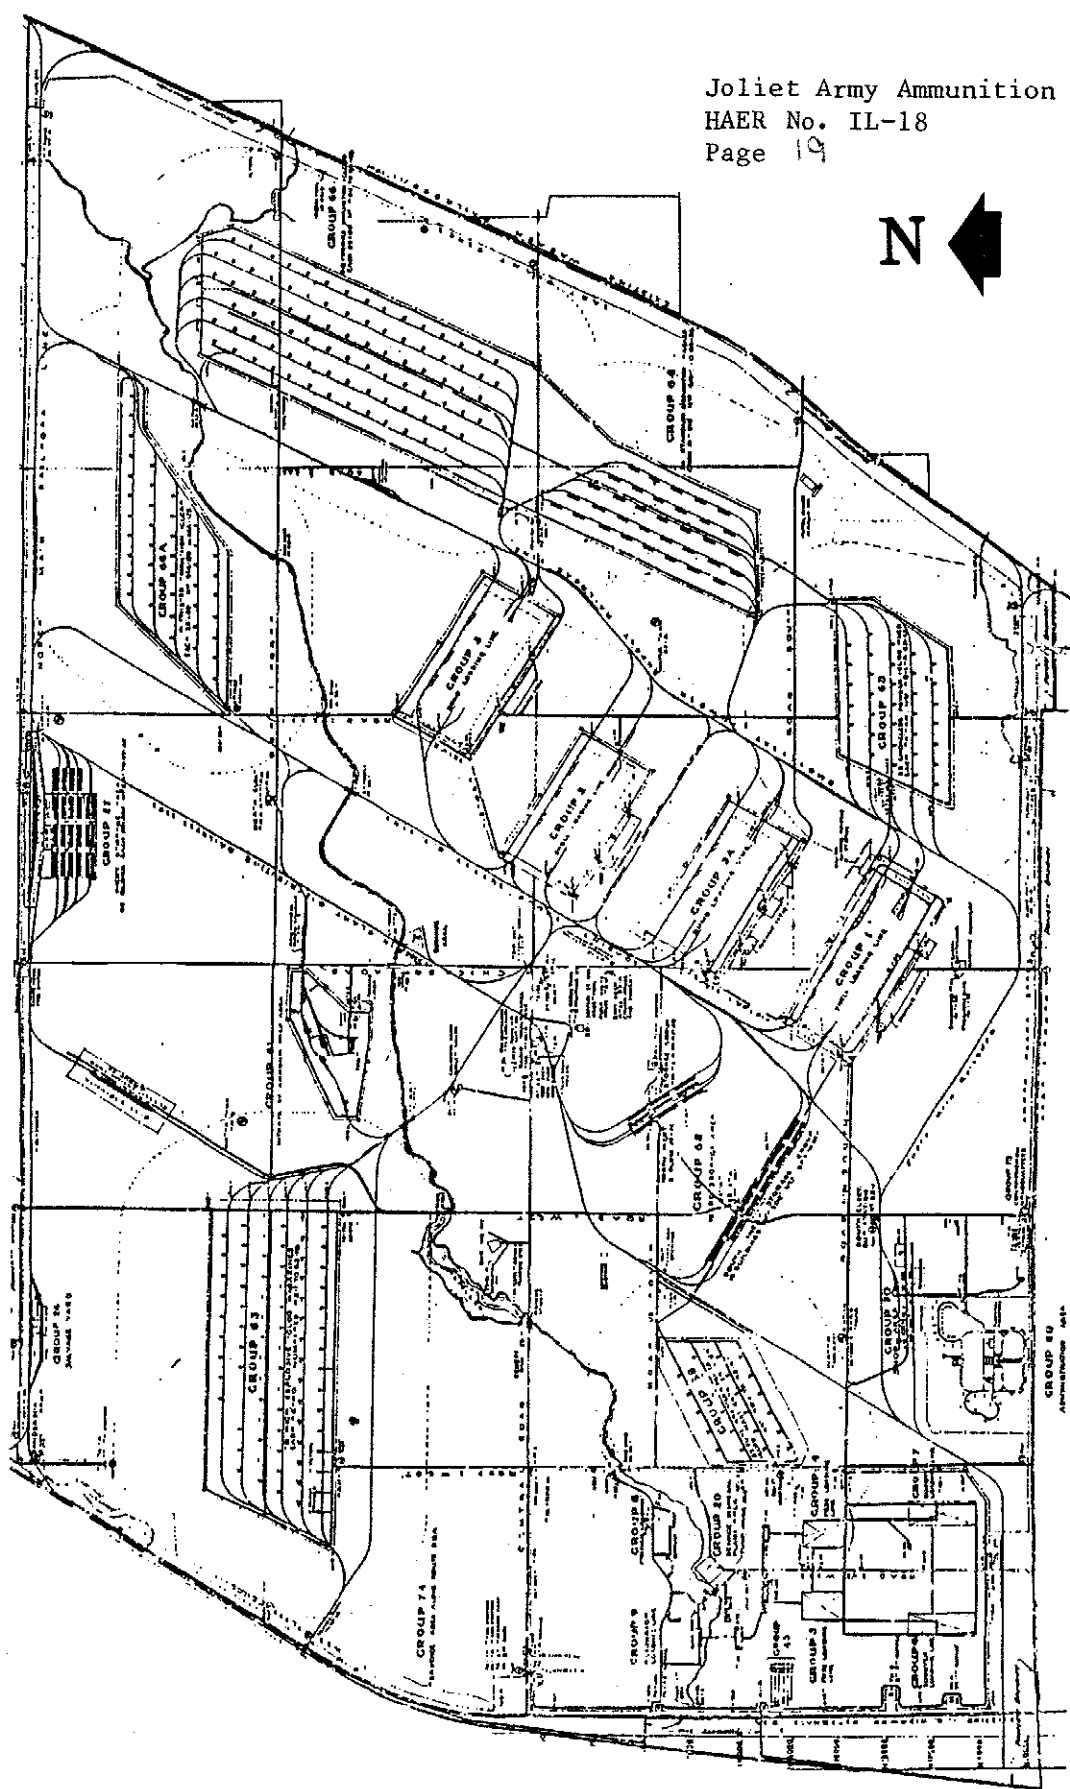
Elwood Ordnance Plant, Site Plan, 1941. (Source: Contractor files, JAAP)
